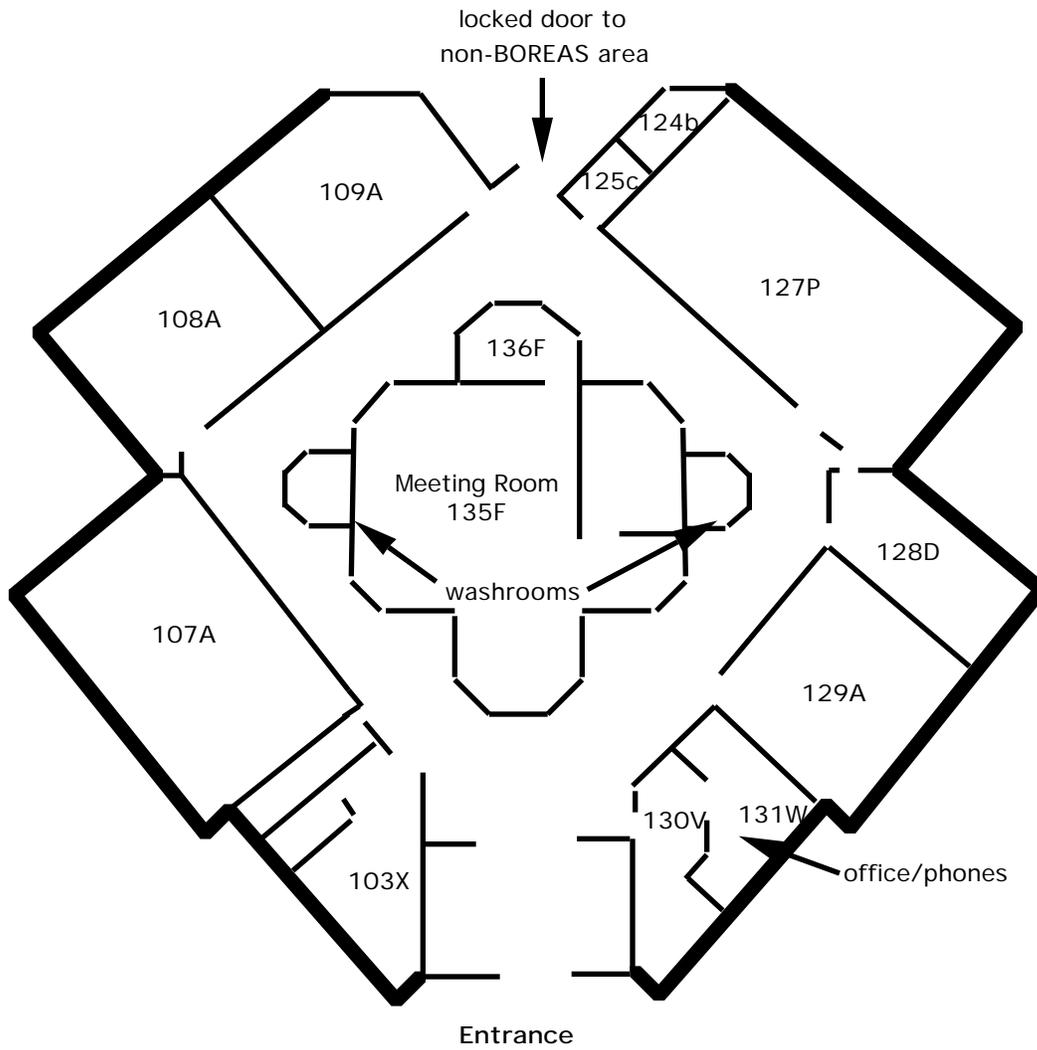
Layout of SSA Lab at Paddockwood School
